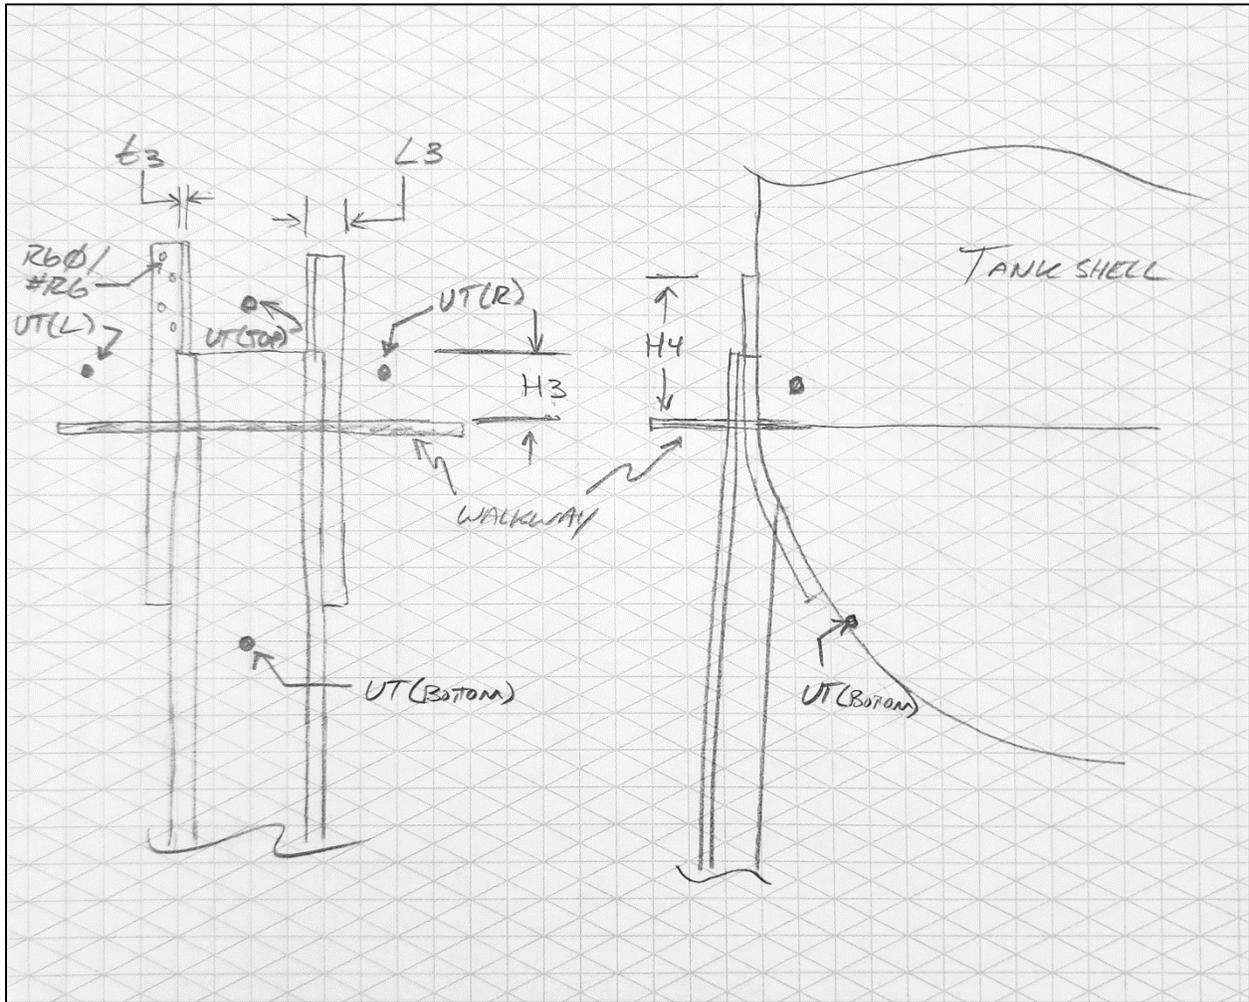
Example sketch roof leg to shell connection – new sketch to be produced if missing dimensions/structural elements are observed at site. Dimensions and UT locations identified.
